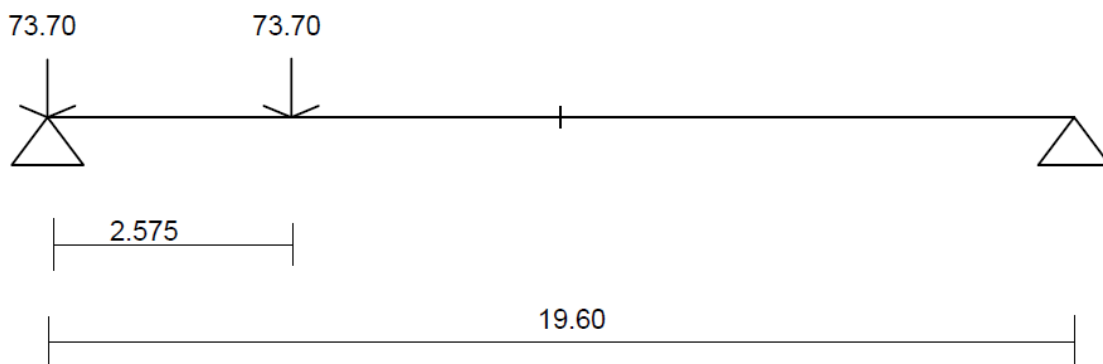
Critical arrangement of vertical shear for maximum shear
